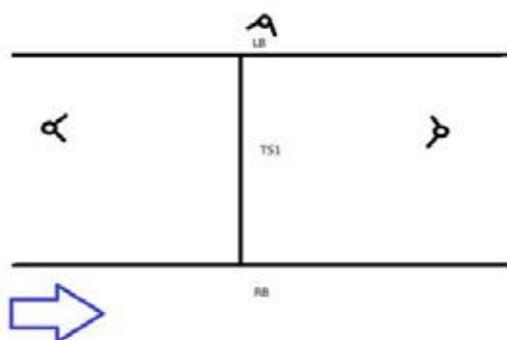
Site plan of Tidal Crane Barrier 7
